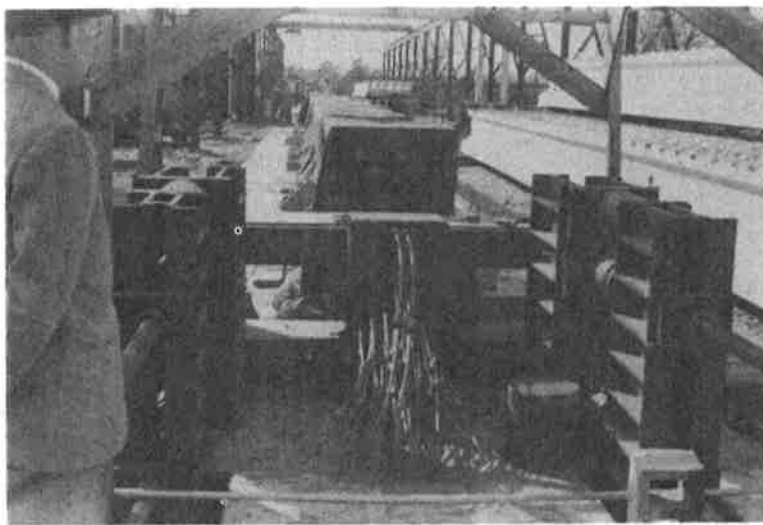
Prestressed beams curing in the prestressing bed, Garden State Parkway bridges, Section II.
